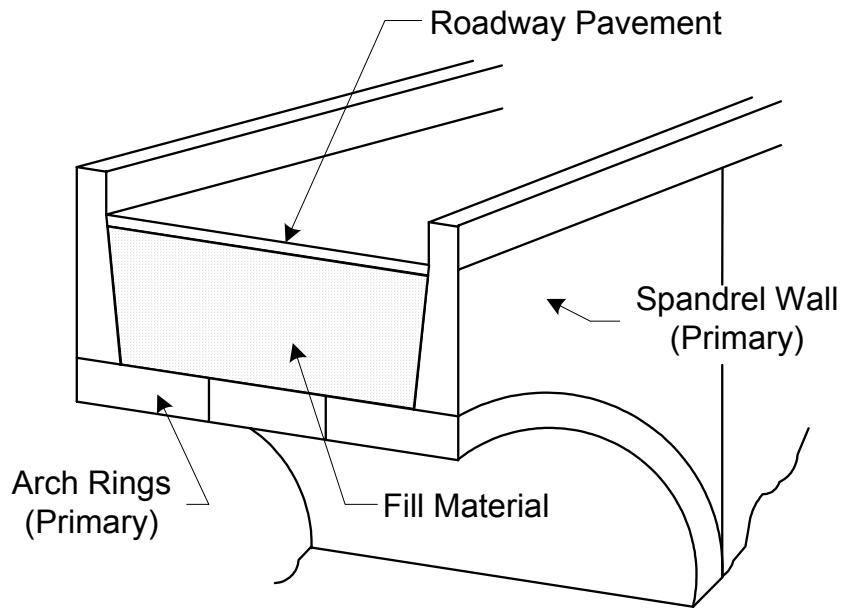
Primary Members of a Closed Spandrel Arch
